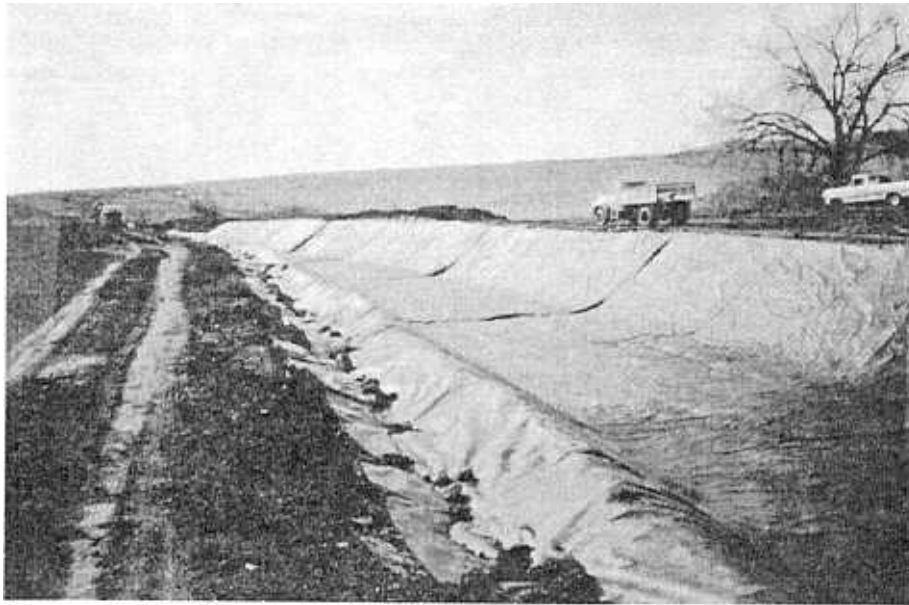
View of installed polyolefin lining showing four transverse field seams. View is looking downstream before filling anchor trenches.
